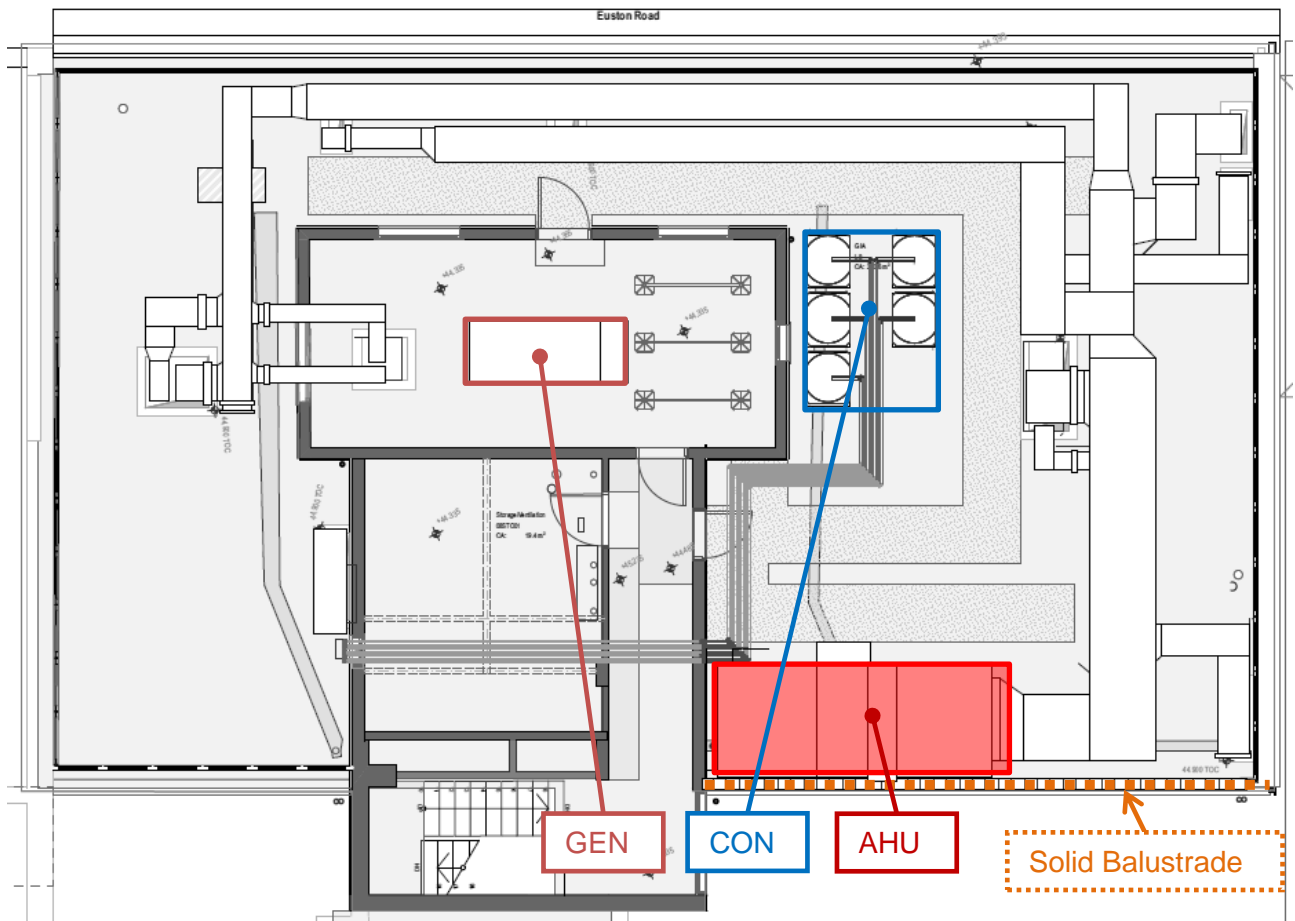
PROPOSED LEVEL 8 ROOF PLANT LAYOUT (NOT TO SCALE)
